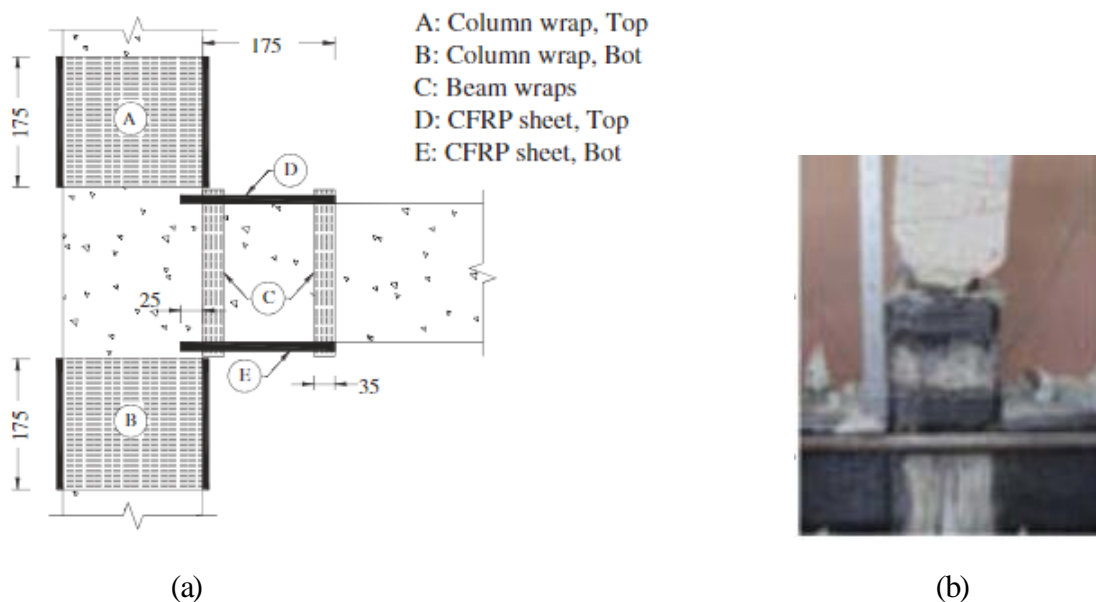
(a) CFRP retrofitting scheme; (b) Failure mode in retrofitted specimen
